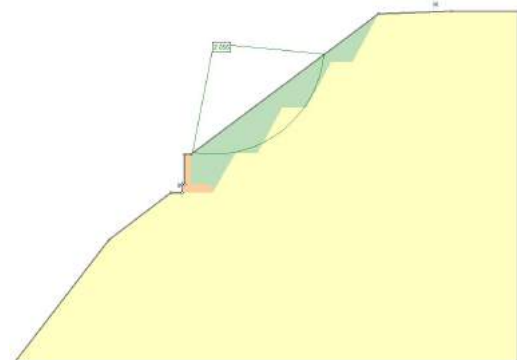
Slope stability check with RC wall and rock cover behind the wall ($F_s = 2.056$)
